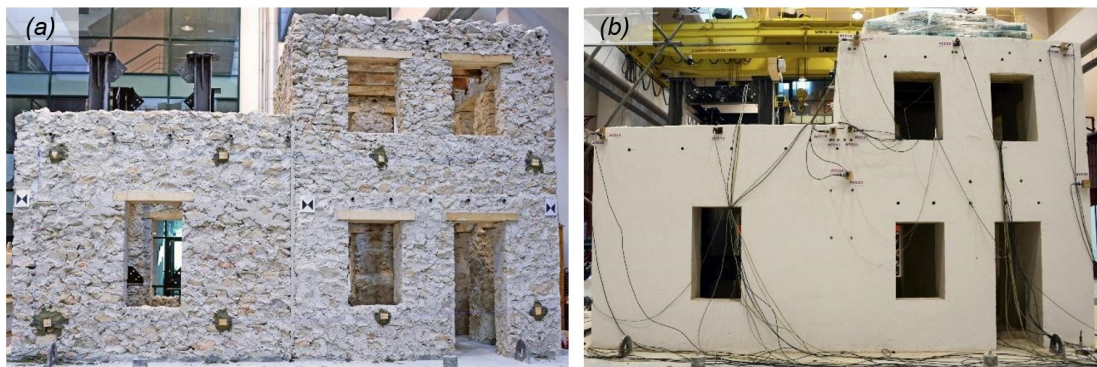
Facade 3 of the half-scale stone masonry aggregate specimen: a) Without plaster, paint, and additional masses; b) Completed test specimen.
